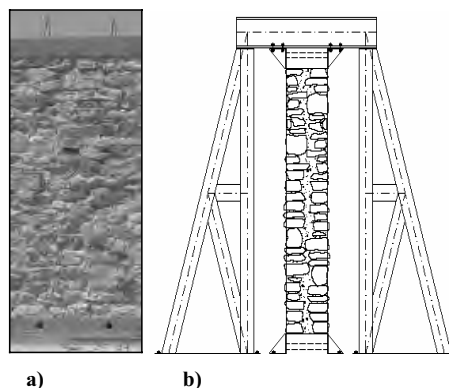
Single panel (a) and steel frame (b) for shaking table tests.
